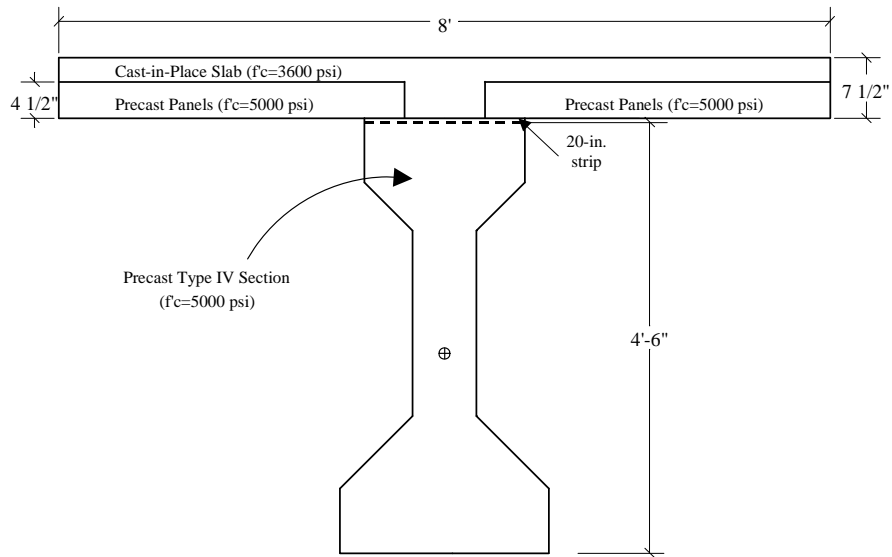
Composite Section for Interior Girder - Slaughter Creek Bridge
